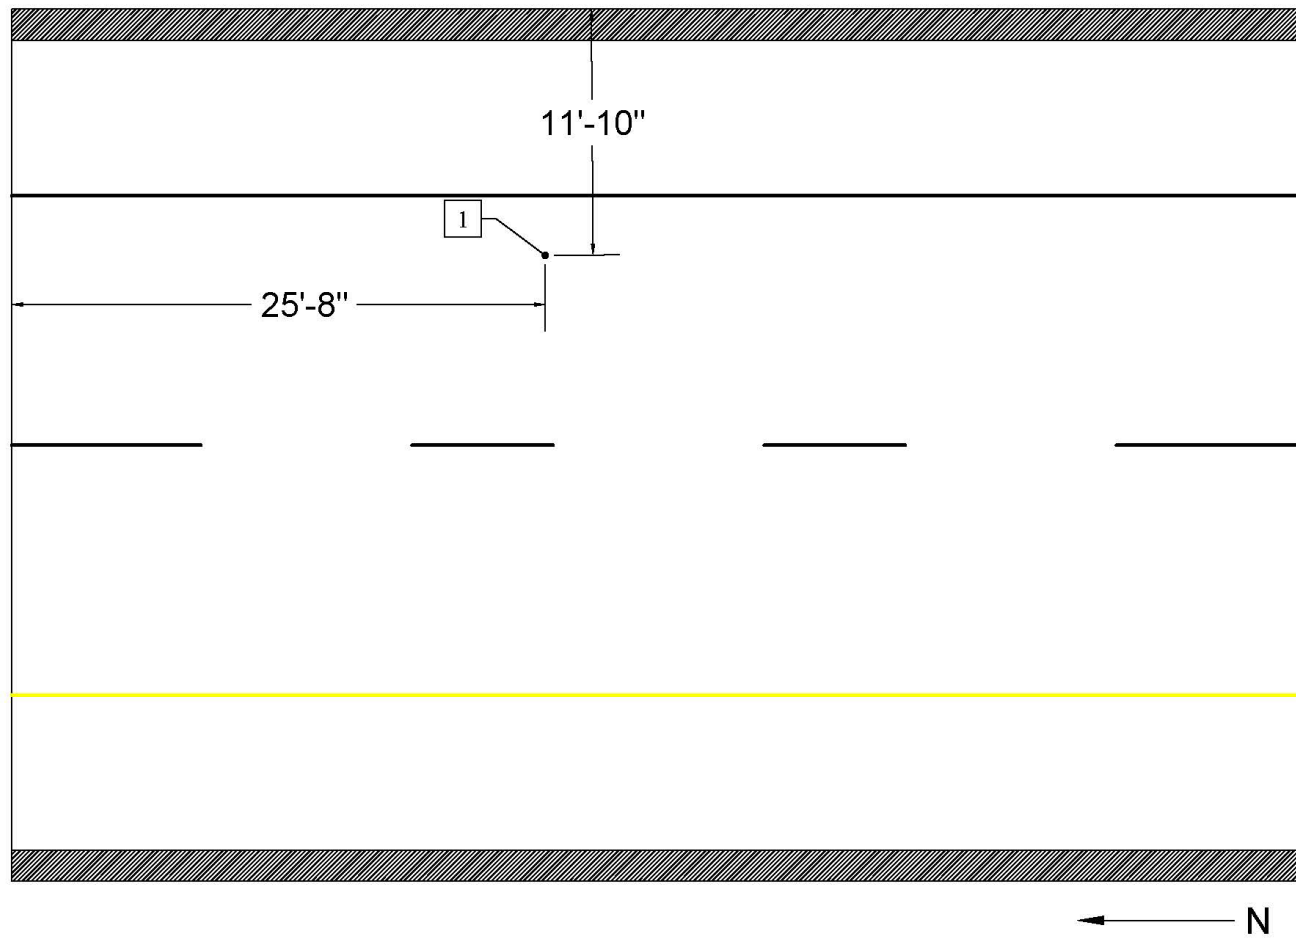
Location of sensor installed in Upper Ridge Road SB deck.
